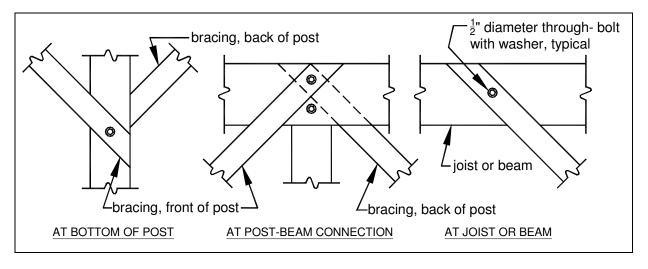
TYPICAL CONNECTIONS OF DIAGONAL MEMBERS
